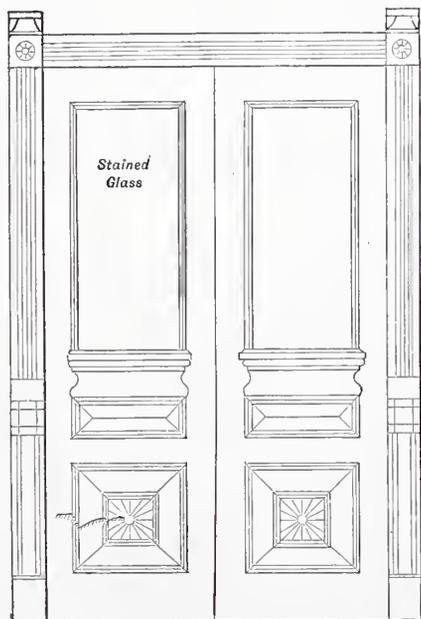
Elevation of Front Doors.—Scale, $\frac{3}{8}$ Inch to the Foot.
